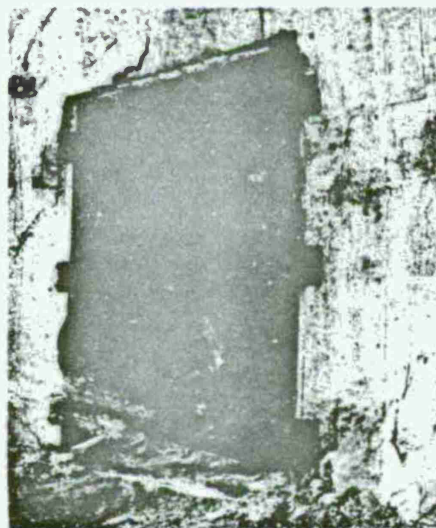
Damaged Headwall of Control Igloo C. Crumpled door and plates are visible.
